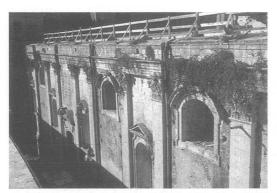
S. Nicolò. Detail of lateral elevation (photo: author)
